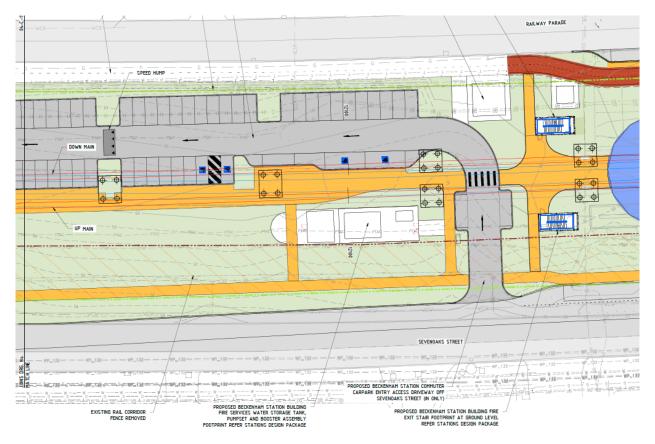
Proposed Beckenham Train Station Park 'n' Ride Parking Facilities (Right Side)
